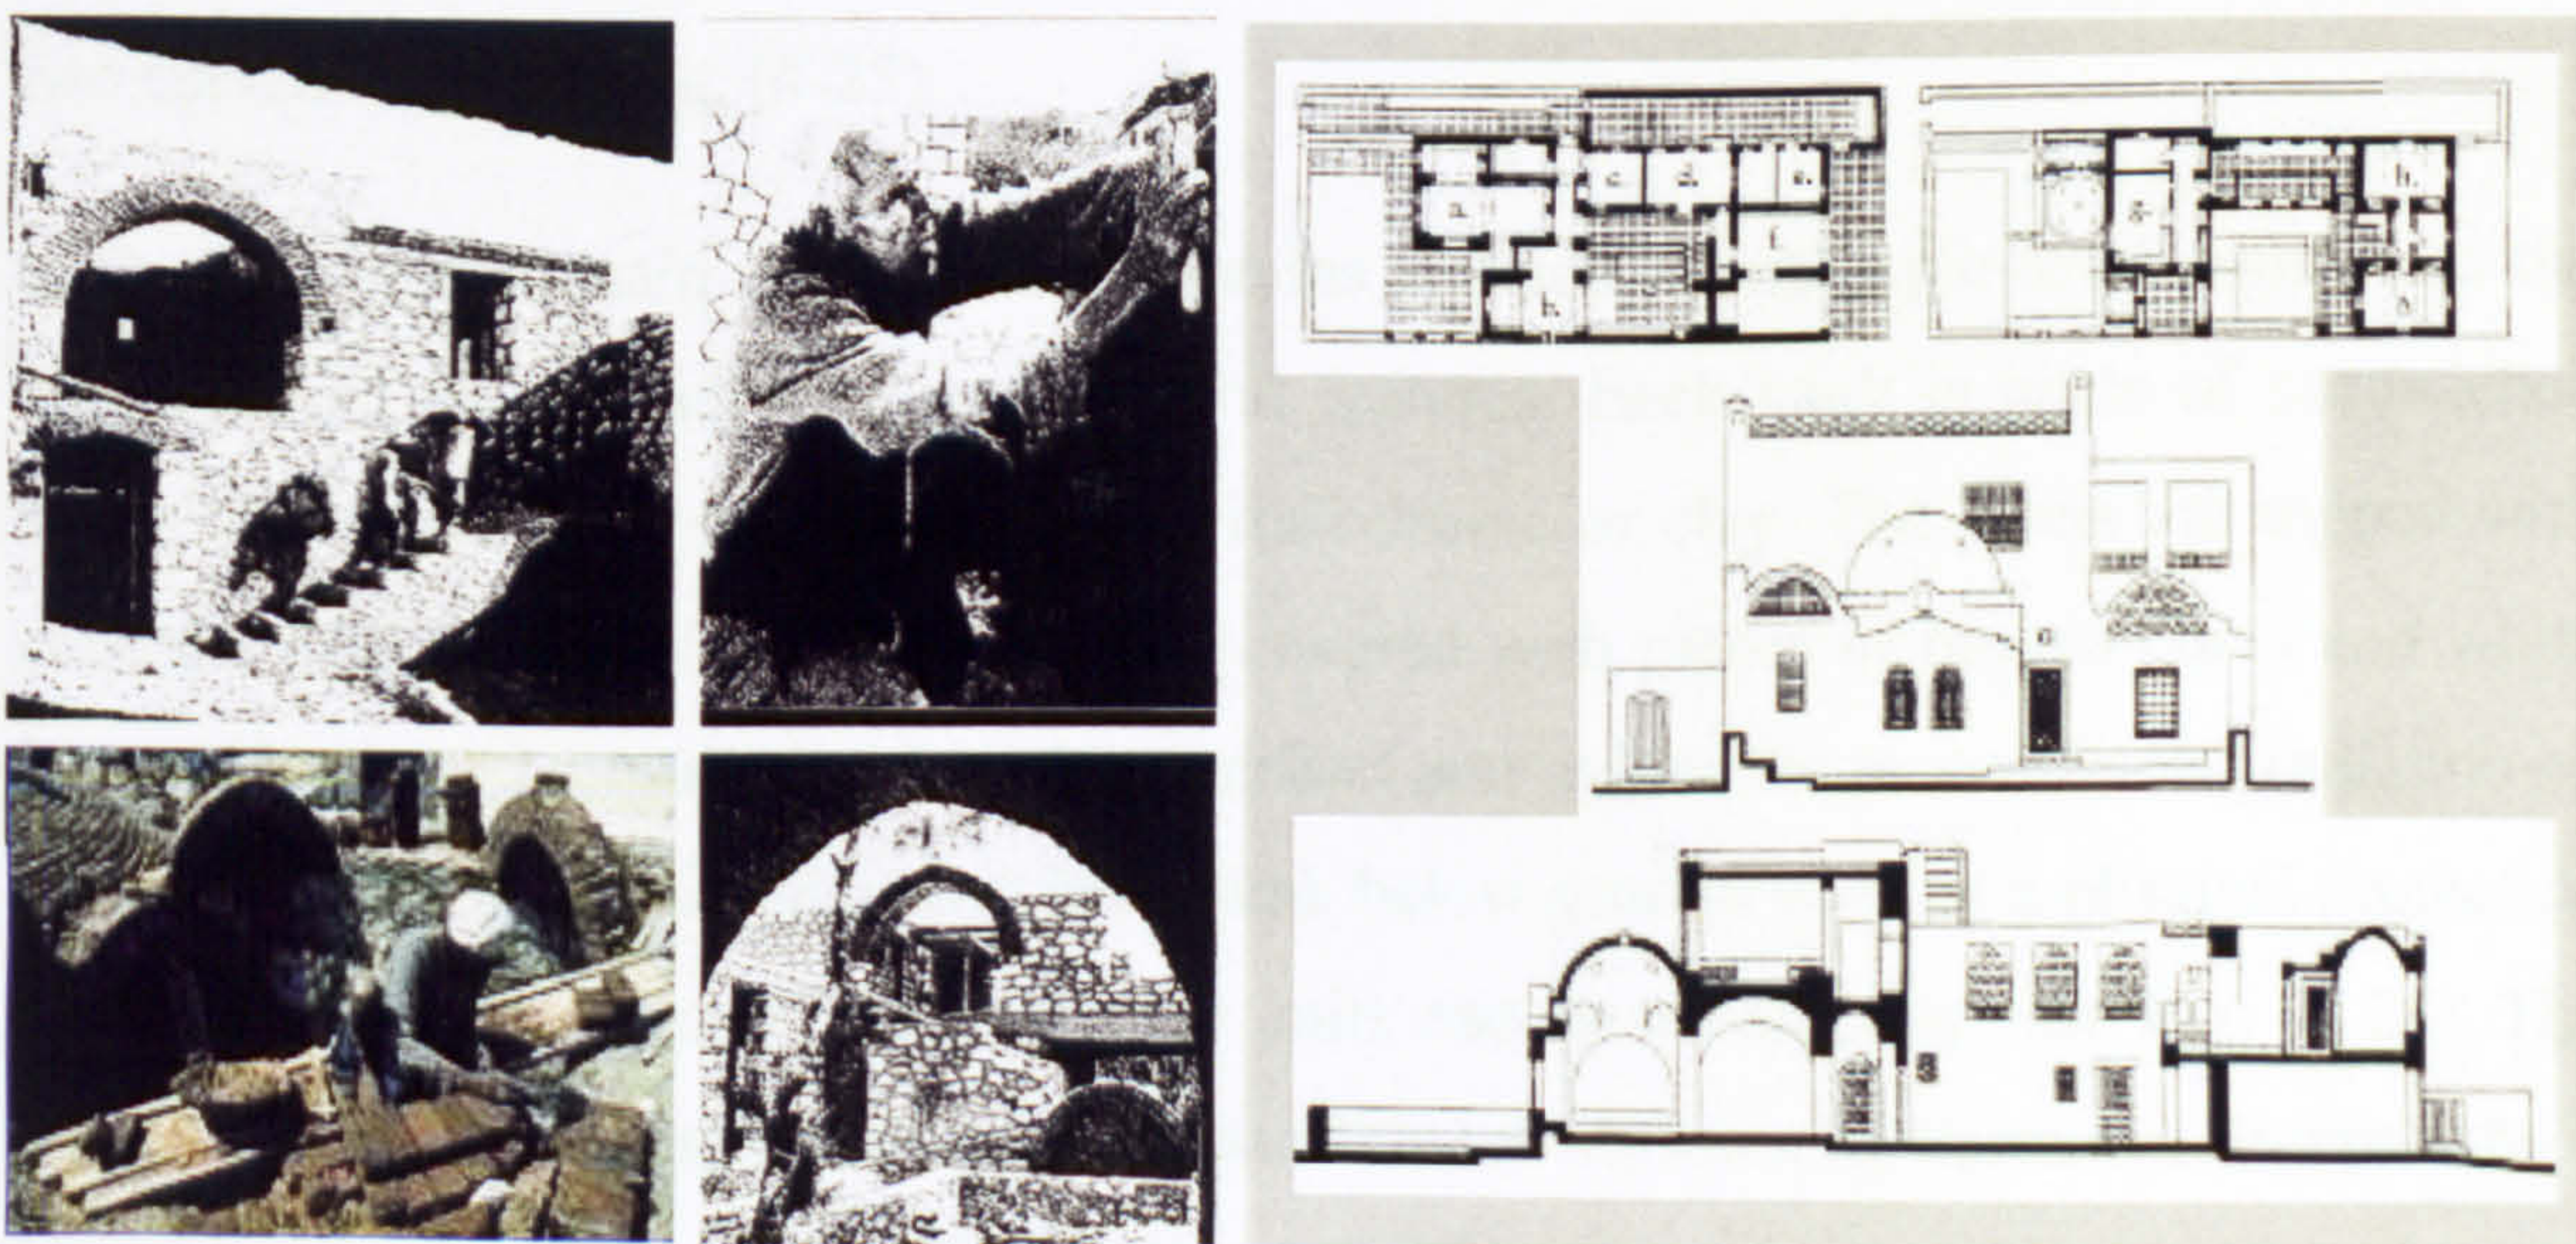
Architectural Drawings and Masonry Work of Halawa House
